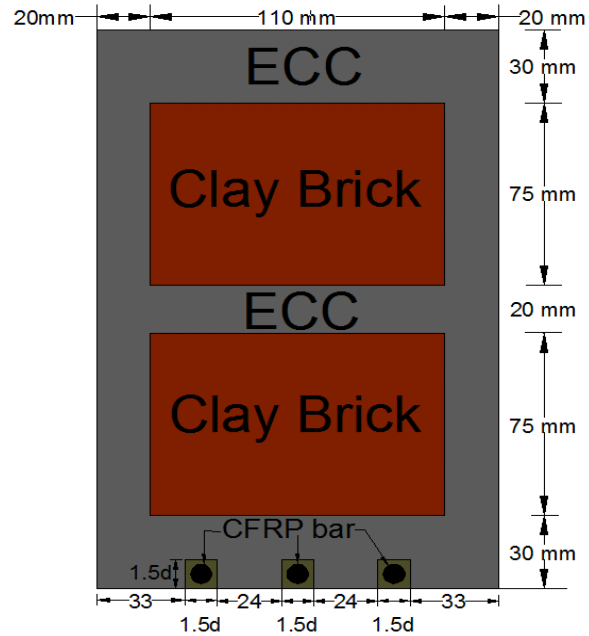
(b) Cross-section of NSM strengthened masonry beam with ECC as bed joint
